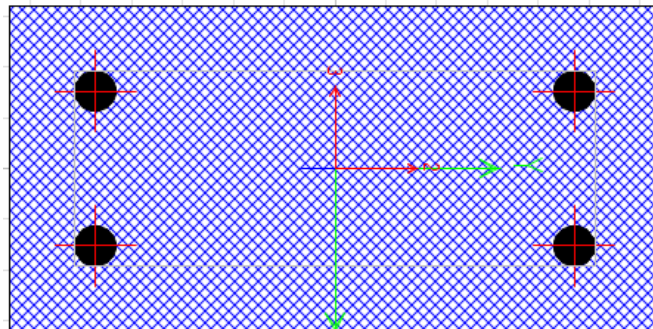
Cross section detail for the EN 1992-1-1 (Computers and Structures, 2016).
